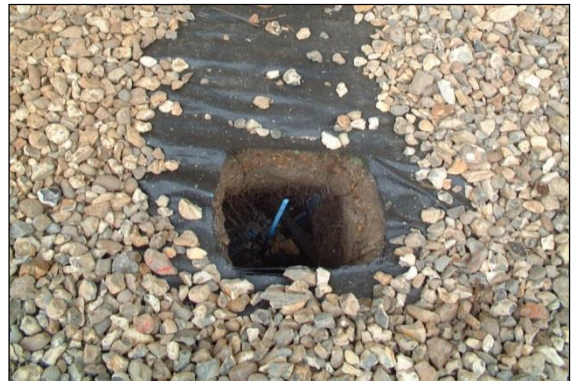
Ground protection must be used to spread the load of the piling rig once excavation has confirmed that no substantial roots are in the preferred pile location.
